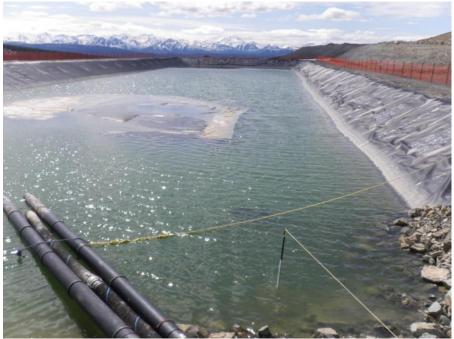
Grum Dump surface water storage pond (May 30, 2012)
